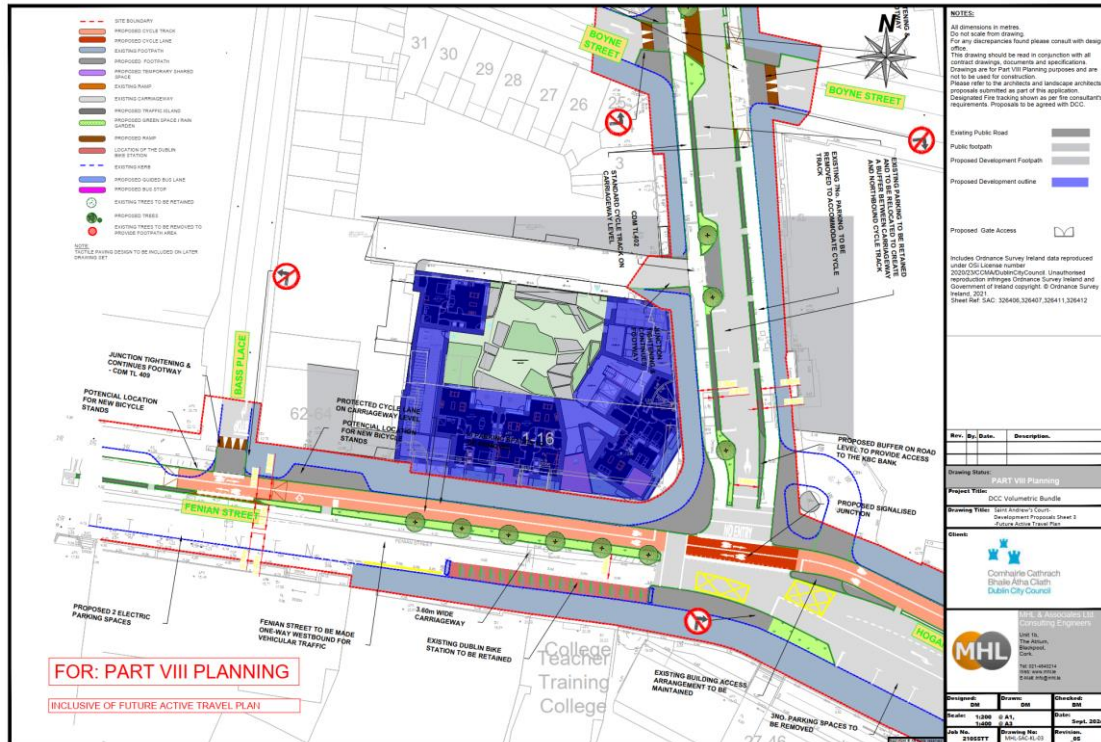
Proposed Future Active Travel Plan in context with the applicant's development site
